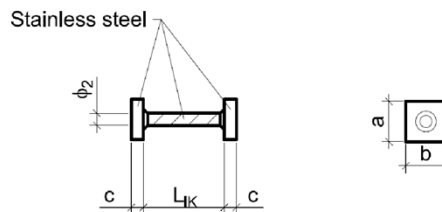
Steel compression element with welded-on compression plates, flush on both sides
